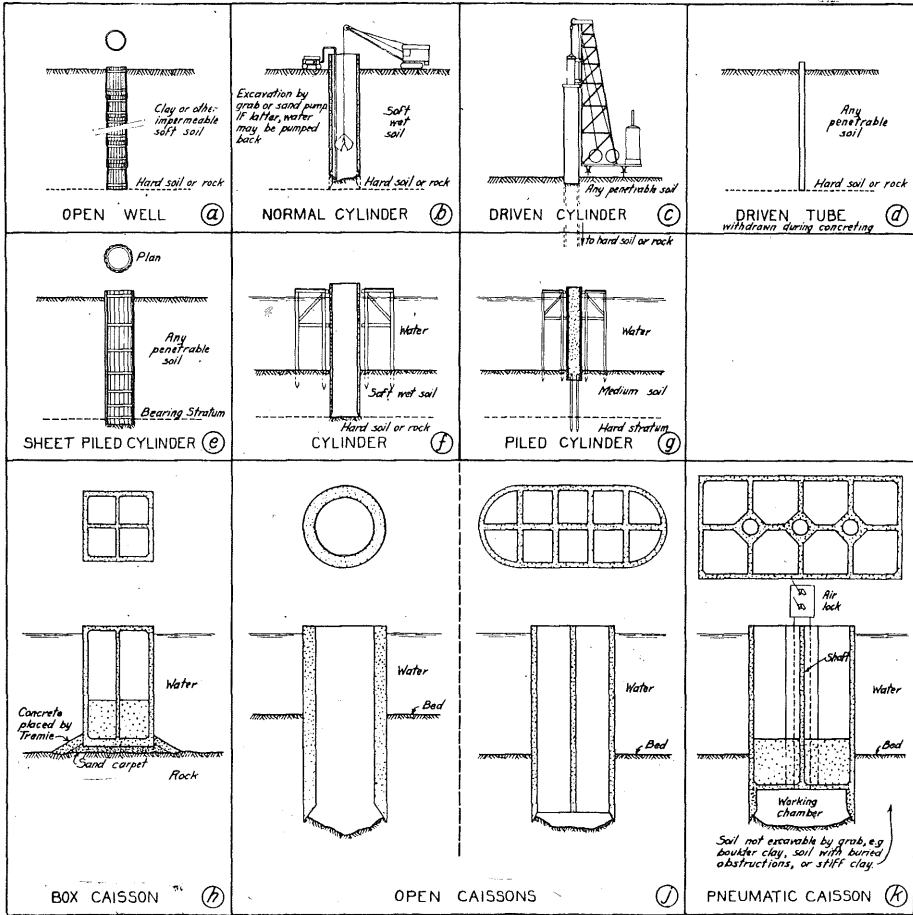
EXAMPLES OF CYLINDERS, CAISSONS, AND COMPARABLE METHODS.
